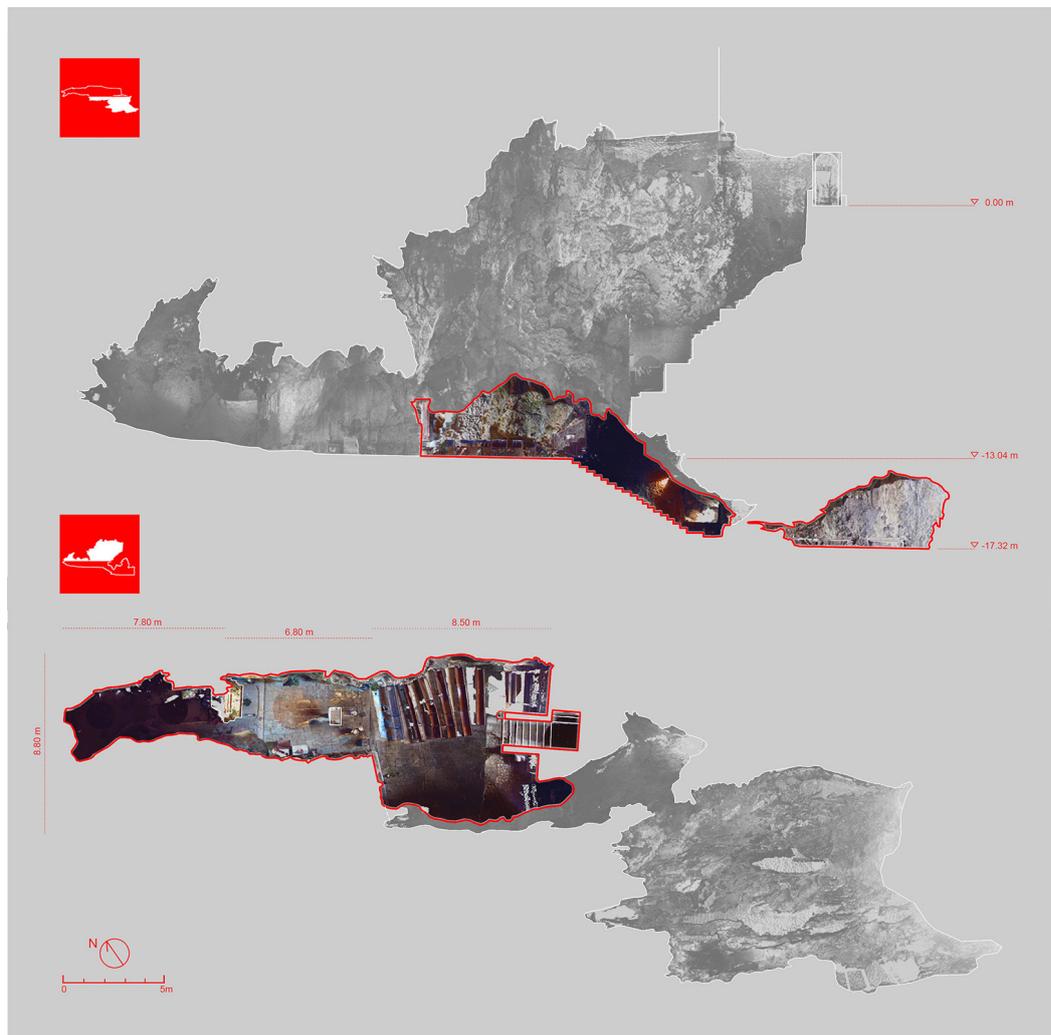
Hermitage of Santa Maria della Stella, Pazzano. Longitudinal section of the connecting staircase between the two levels (top). Plan at -11.00 m (bottom). Graphic elaboration by Placido Pellicano.
